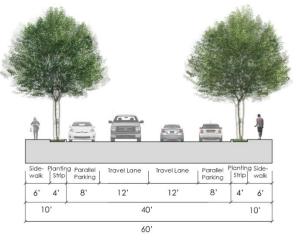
North Pioneer Street details as adopted in the Lowell Downtown Master Plan.
